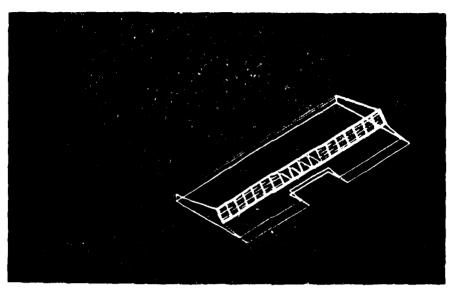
Roof section laid out in SKETCH and extruded. Louver windows and solar collection panels are built in 2-dimensions and placed on roof.
